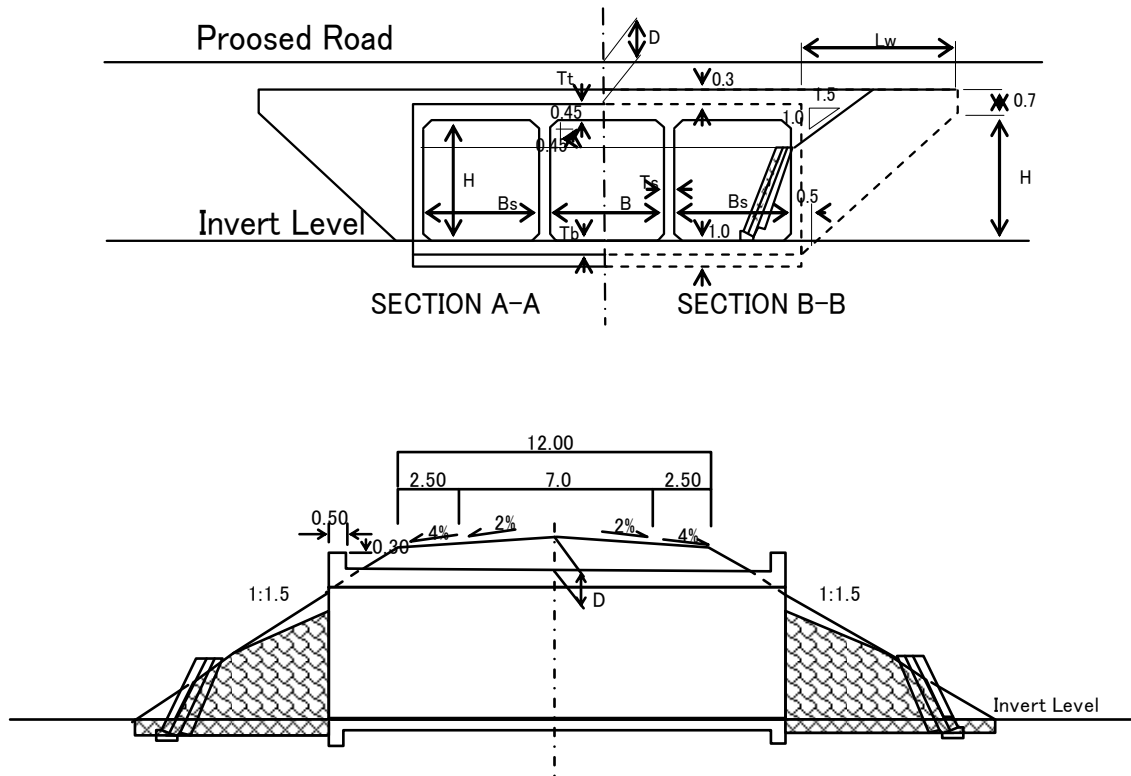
Cross-Section of Main Structure (Box Culvert)
